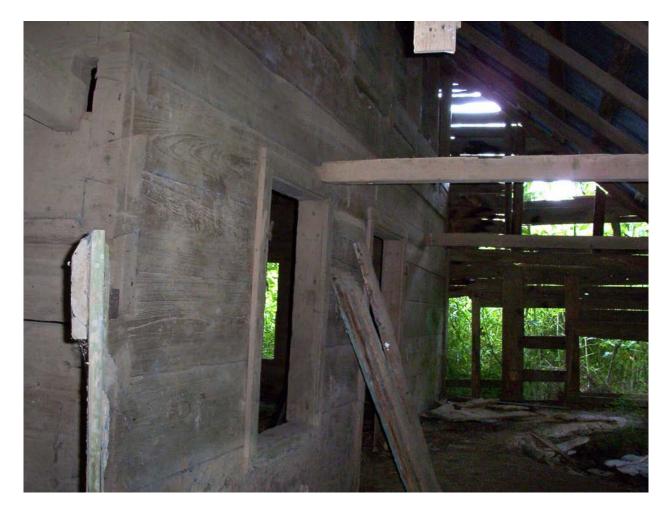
Ceiling joists were added during the Phase III construction of the "barn."
